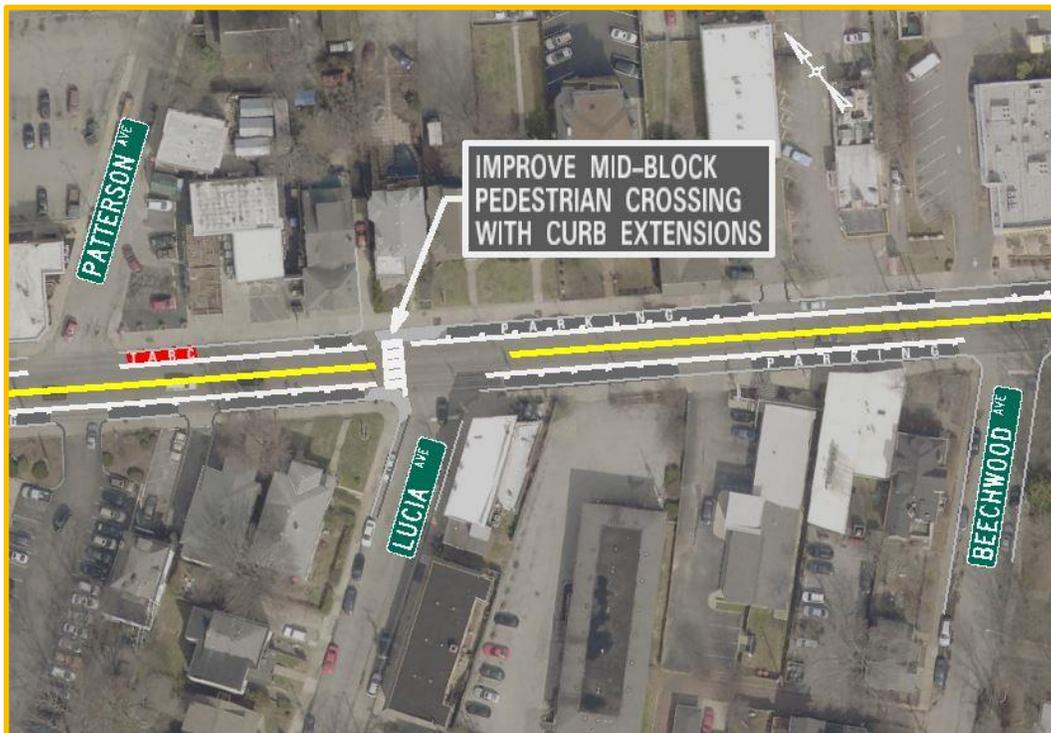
Bardstown Road at Lucia Avenue—Proposed Configuration
